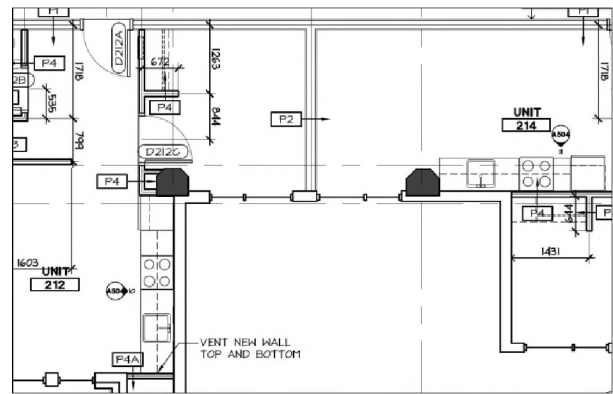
Floor Plan Units 212 and 214 Showing Test Wall
